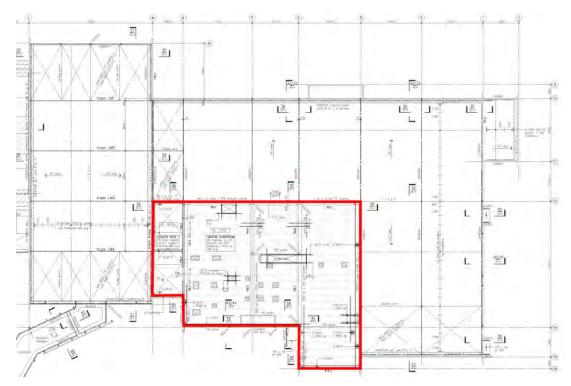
SOU Theatre area roof plan (red line shows extent of plant room floor)
